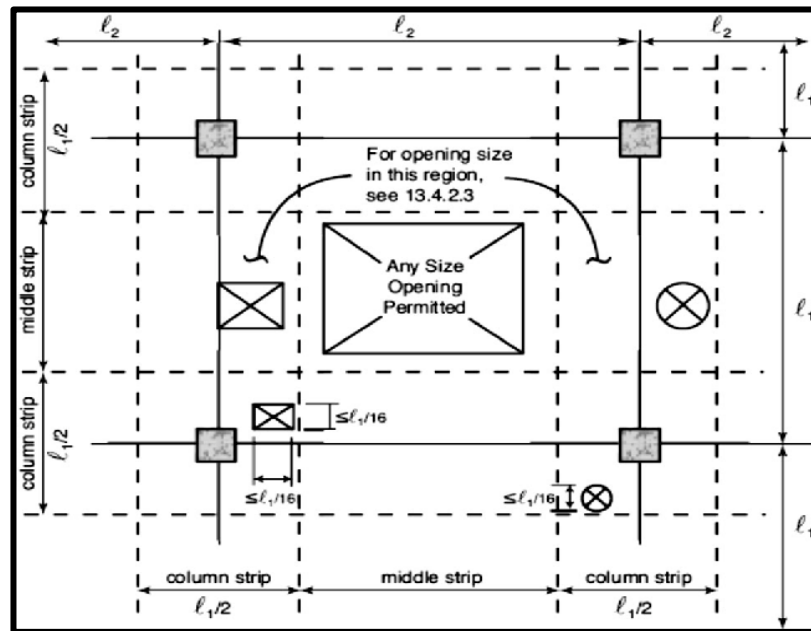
Suggested opening size and location in flat slab (ACI318-14).
